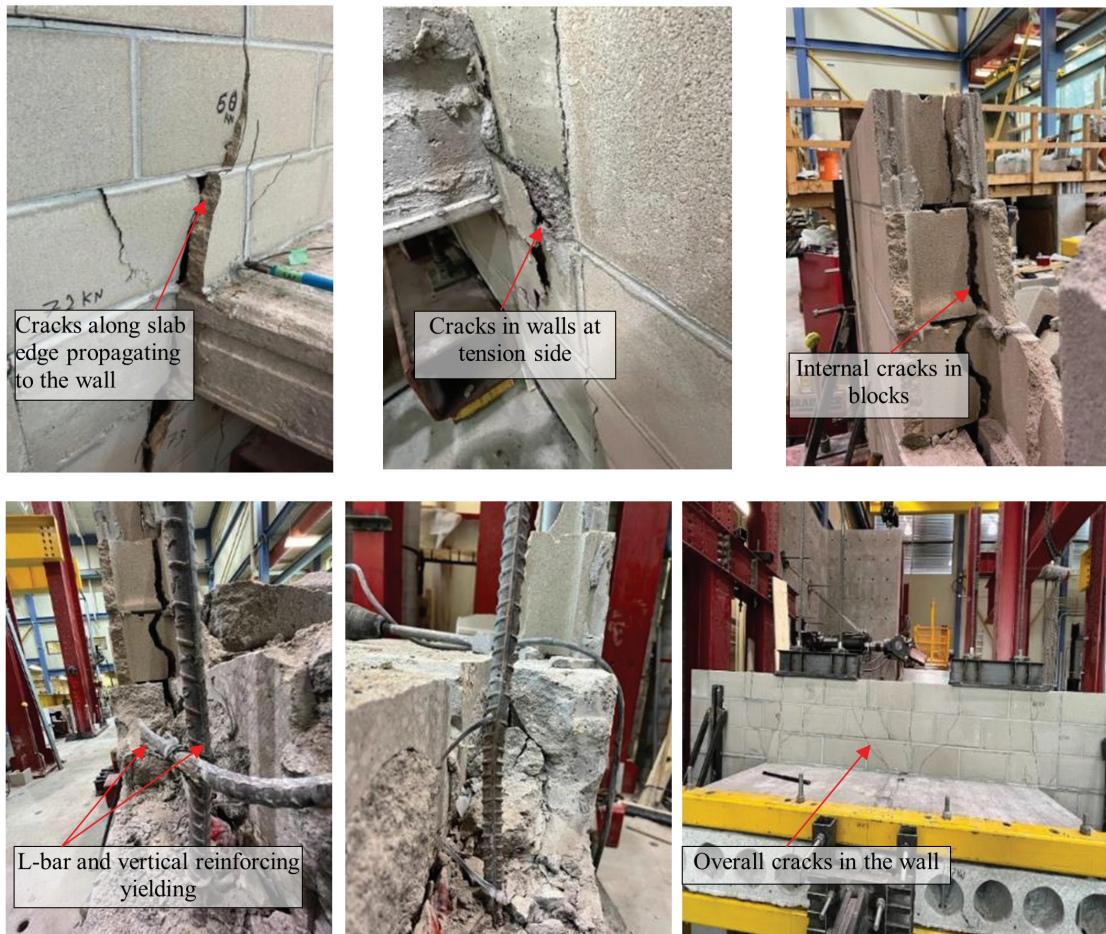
The mode of failure for specimen EB-T-L-5 (end bearing configuration with tensile loading and an L-shaped bar connection at the fifth story).
